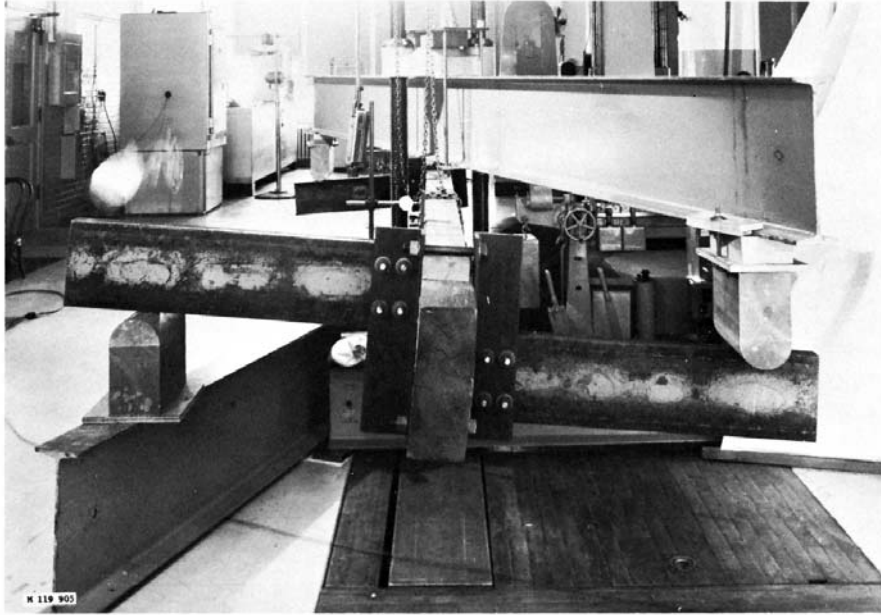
Example of Torsion Test of Structural Member in a Universal-Type Test Machine
